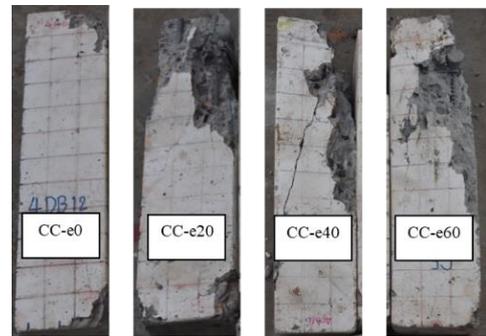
Failure Patterns of Control Reinforced Concrete Columns (CC).
